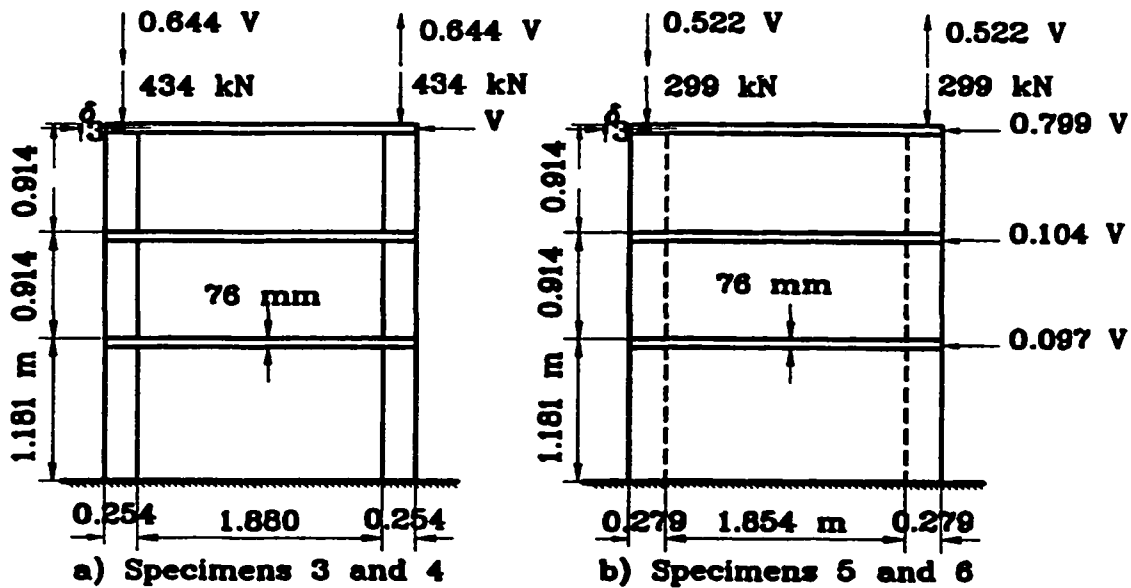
Detailed cross section of framed and rectangular walls (Vallenas et al, 1979)
